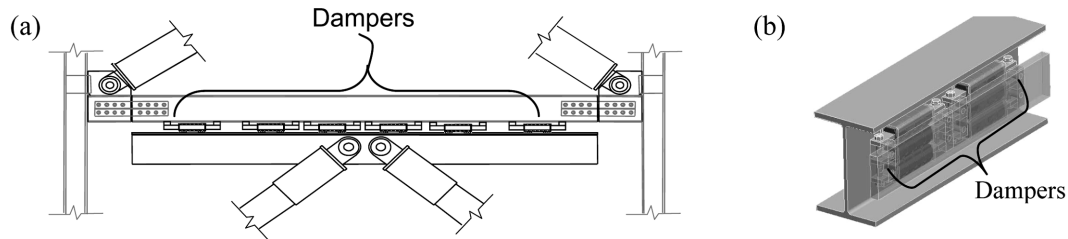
Elastomeric damper installation detail: (a) beam bottom flange; (b) beam web
